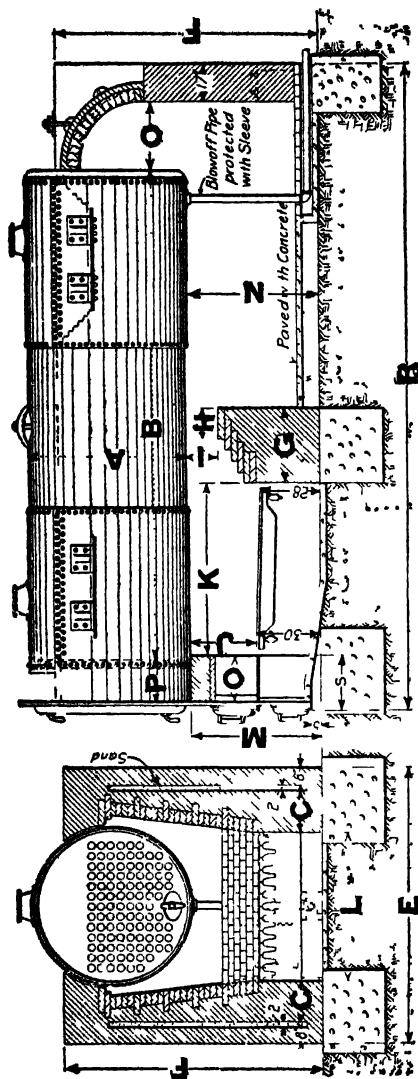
,388.—Setting design for overhanging front boiler The dimension letters refer to the accompanying table of dimensions for boiler setting
